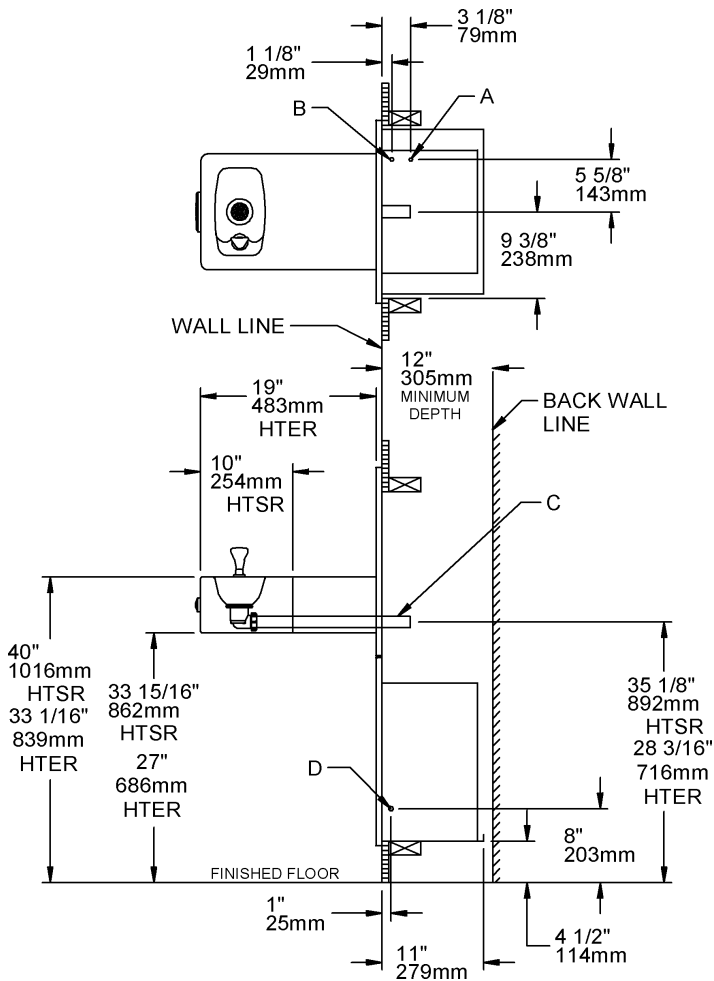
Rough-In Assembly Single-Station Mounting Frames
